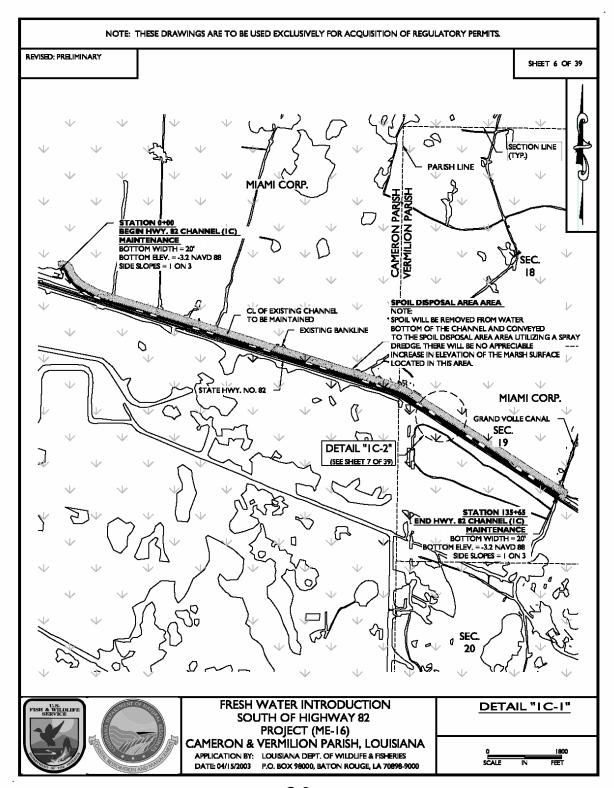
Freshwater Introduction South of LA Highway 82 Project Hwy 82 Channel Enlargement Plan and Cross Sectional Views
